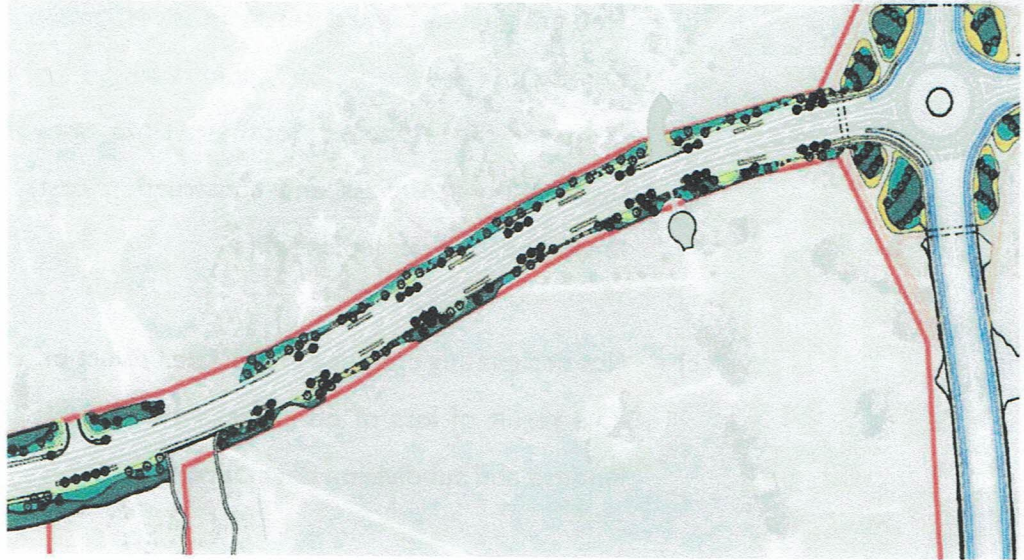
Concept Plan (Intersections and property access subject to detailed design)
